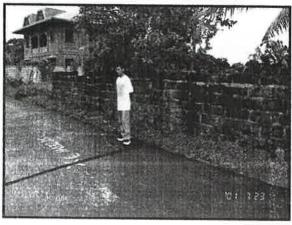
Taken at Sta. 1+032.05, the alignment crossing a Brgy. Road at Tiaong. The unfinished concrete house on the background would be directly hit the alignment.
